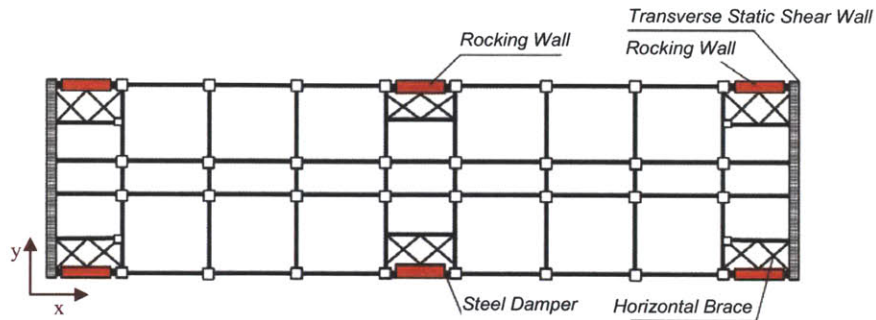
A plan view of the retrofitted case study building. Red represents rocking walls.^{30(adapted)}
